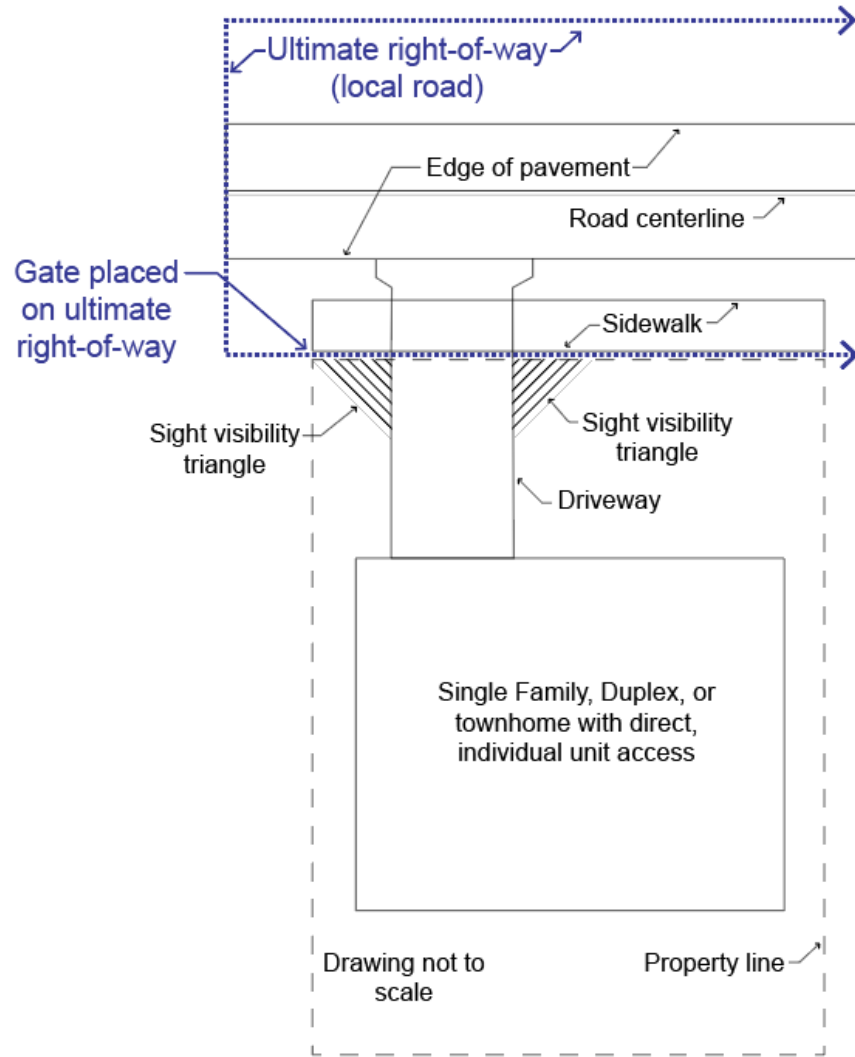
(D)4 – 2a: Example Access Gate with Direct Individual Unit Access from a Local Street
